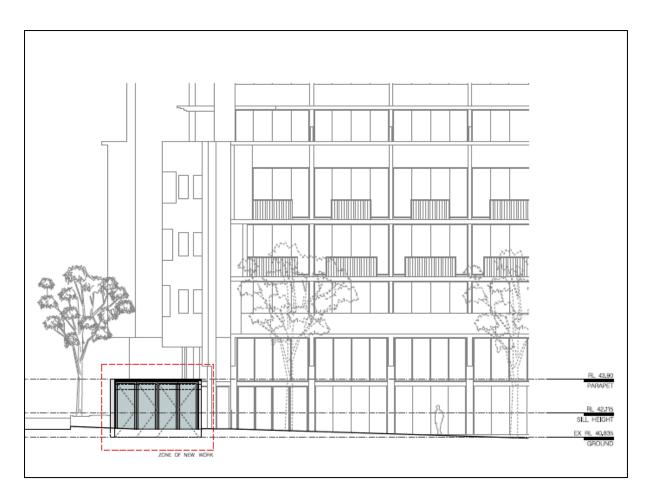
Proposed west elevation to Waterloo Street with enclosure outlined in red
